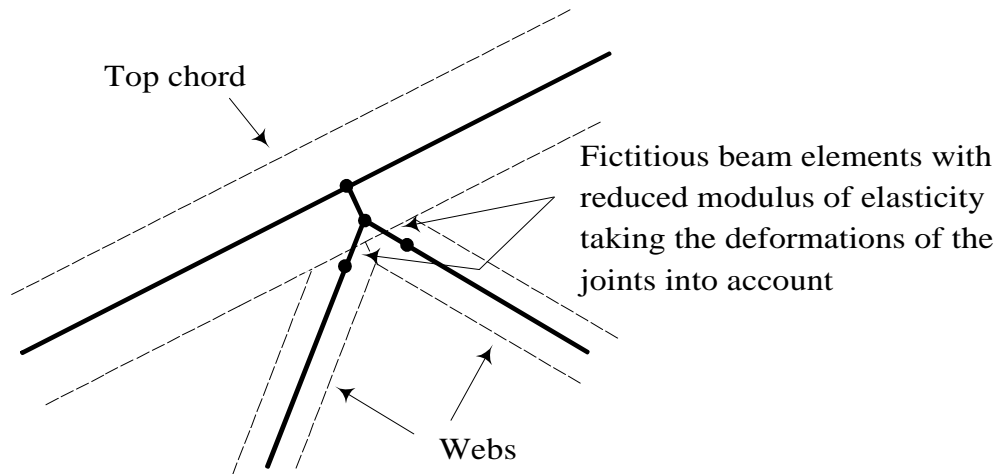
Model 1 for joint modelling – joint between rafter and two webs.
